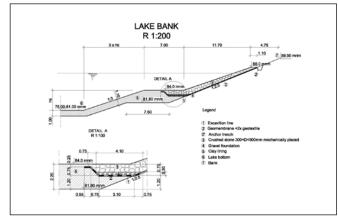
Typical lake bank section with anchor bench CCL/EPDM tie-in at the 84 m elevation.
